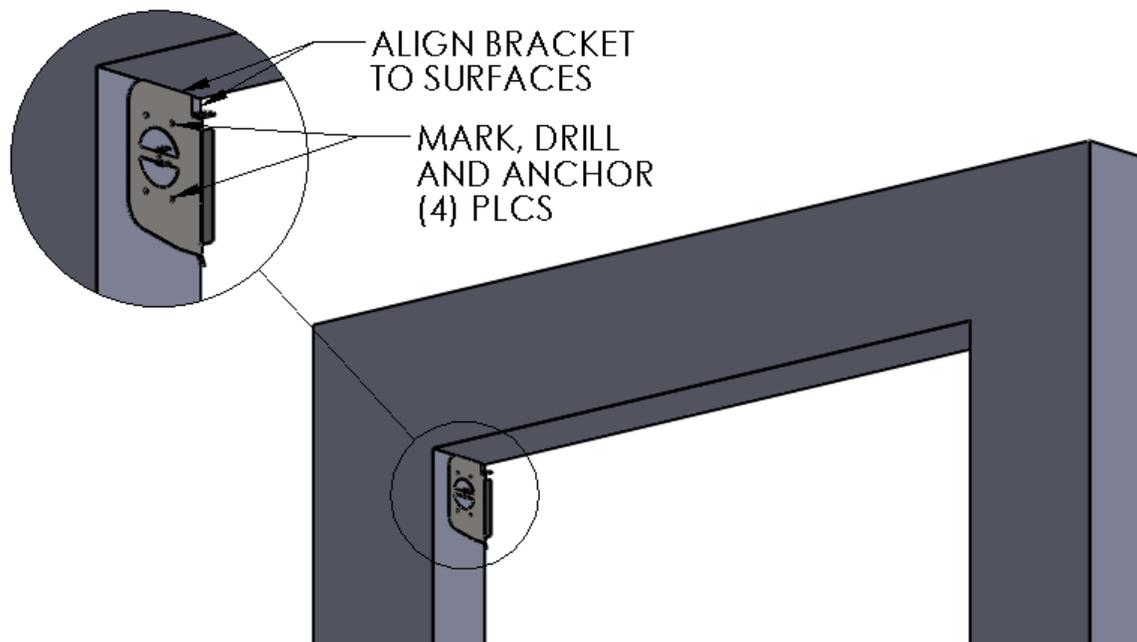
LOCATE & INSTALL L.H.HEADER MOUNTING BRACKET
